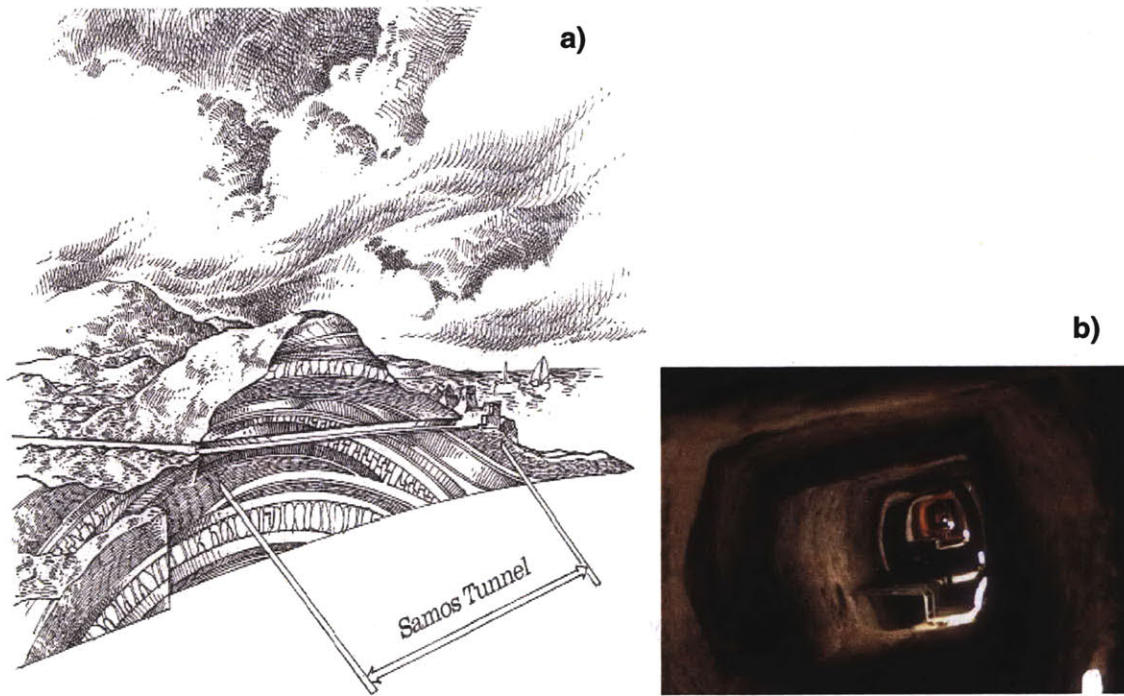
a) Illustration of Samos tunnel in Greece; b) picture taken inside the tunnel. In cross section the floor is more or less horizontal but the roof slopes along the rock strata (Apostol, 2004)
